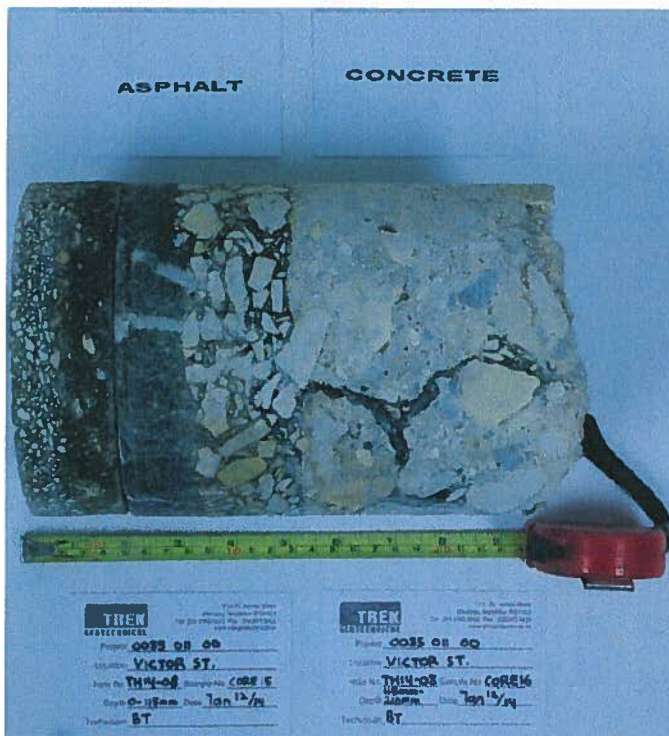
Asphalt and Concrete Core Sample from Test Hole TH14-08
